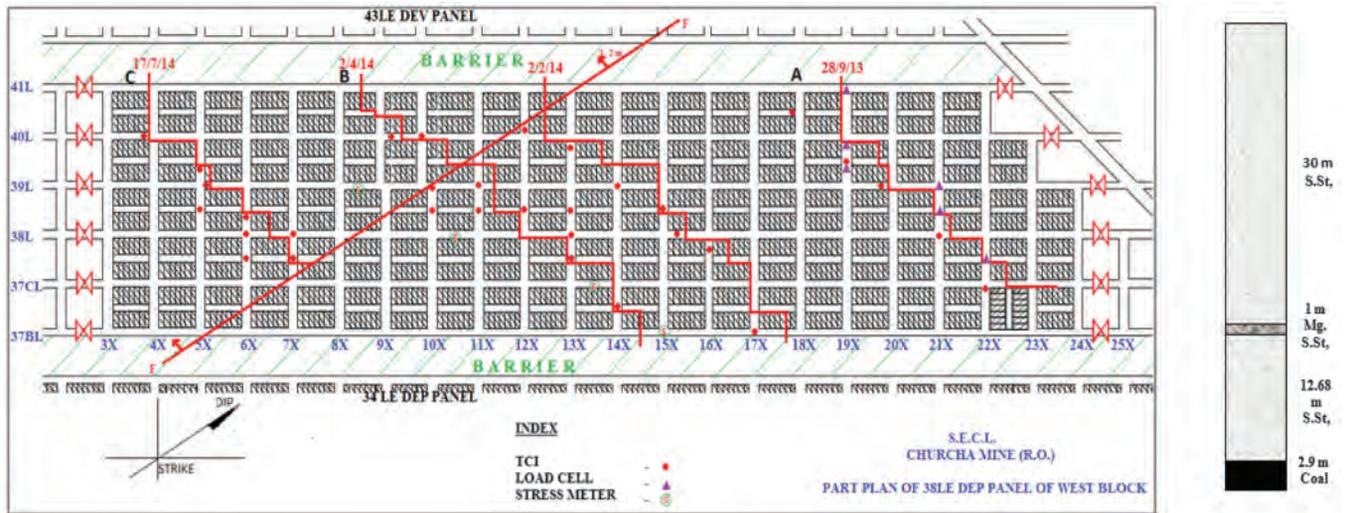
Working plan of 38LE panel, Churcha UG with fall details cross section of roof formations including coal seam
